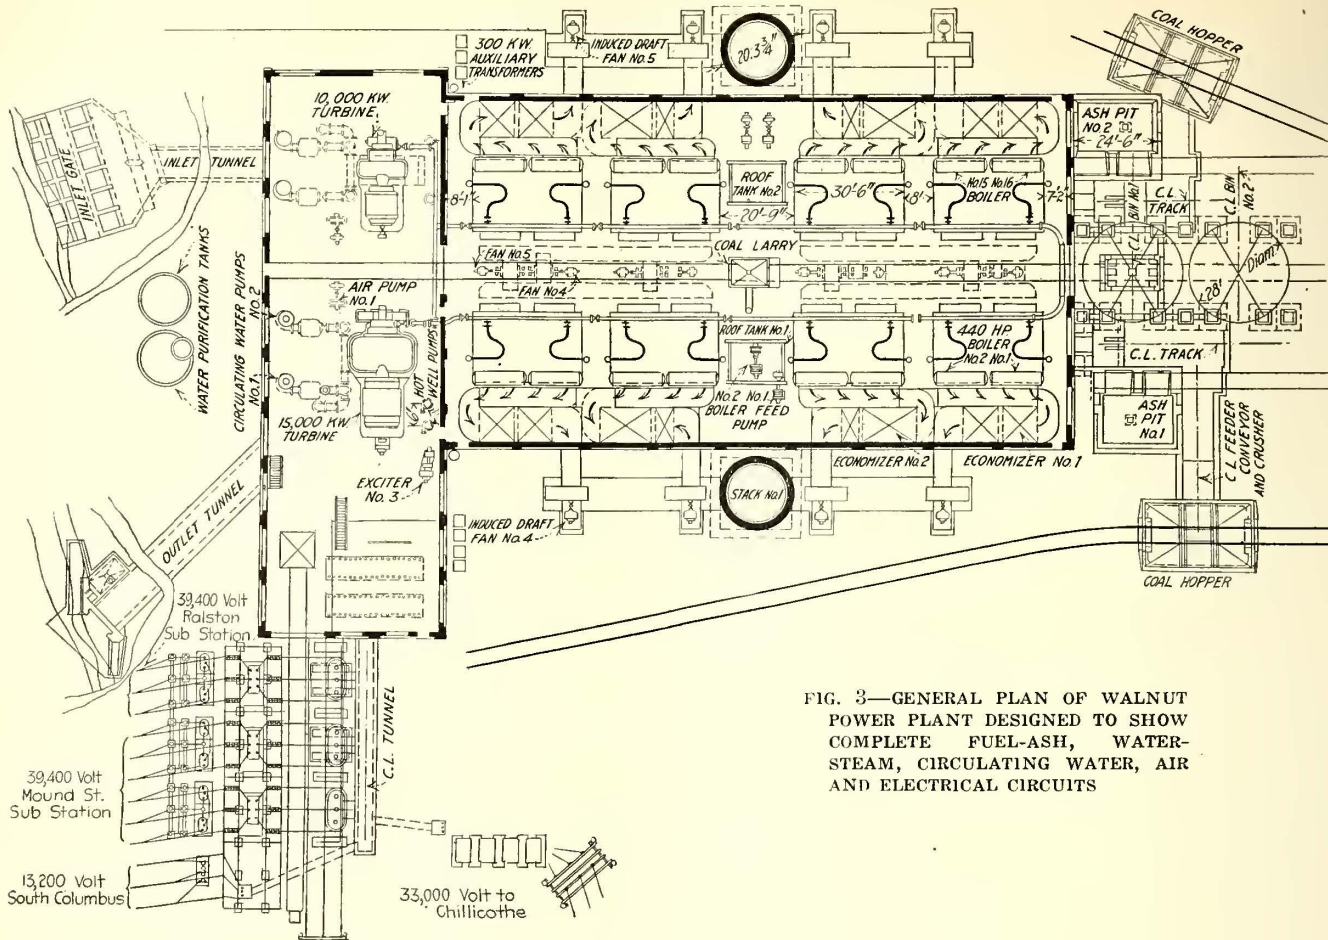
GENERAL PLAN OF WALNUT POWER PLANT DESIGNED TO SHOW COMPLETE FUEL-ASH, WATER-STEAM, CIRCULATING WATER, AIR AND ELECTRICAL CIRCUITS
